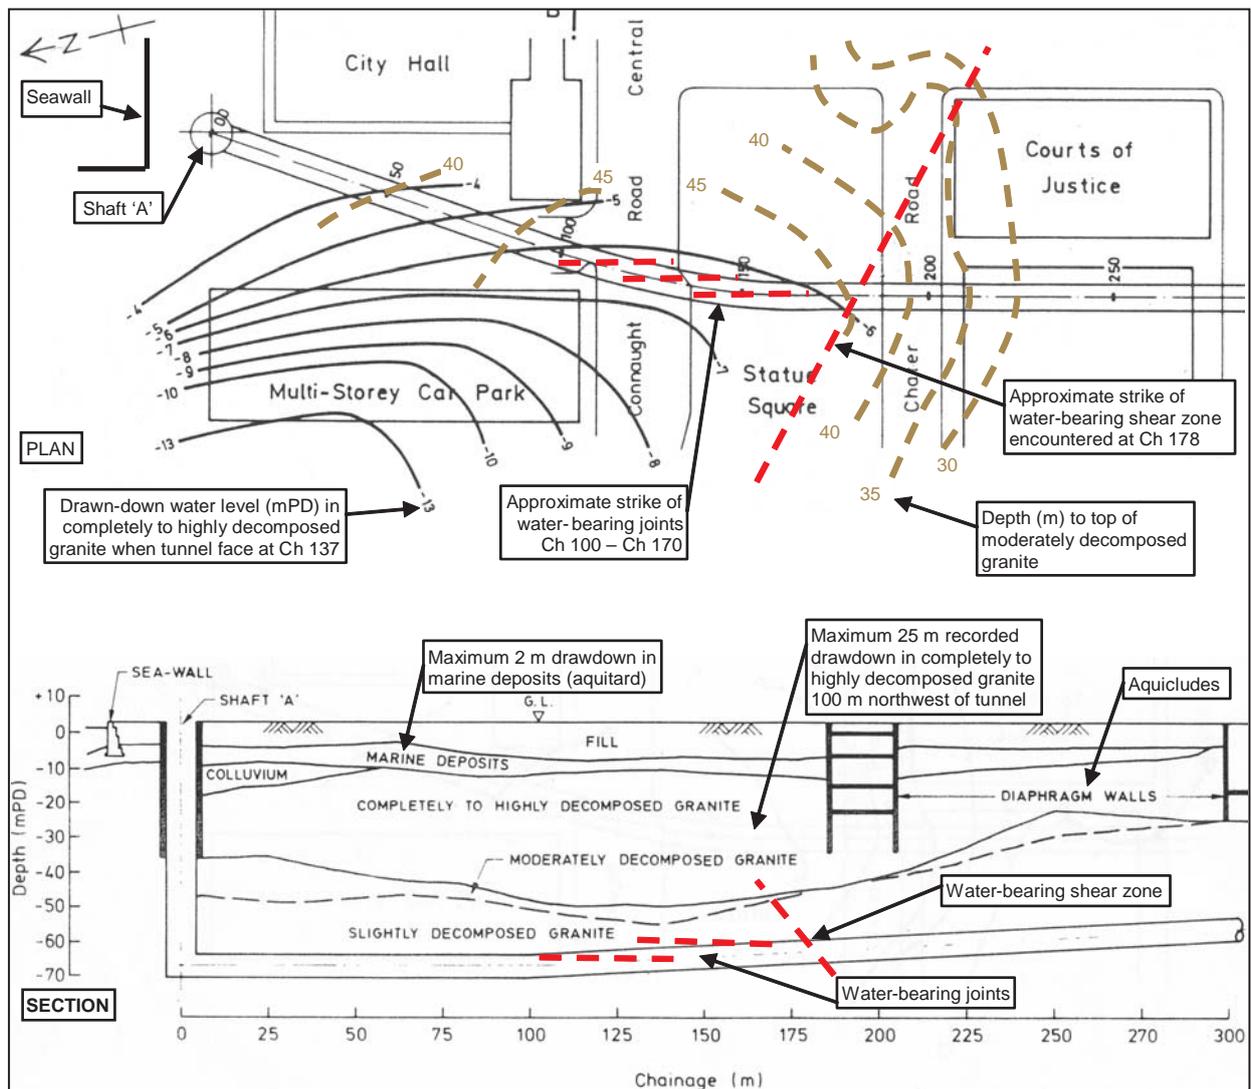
Plan and section showing geological model and groundwater drawdown during rock tunnelling works (after Cowland & Thorley, 1985)
